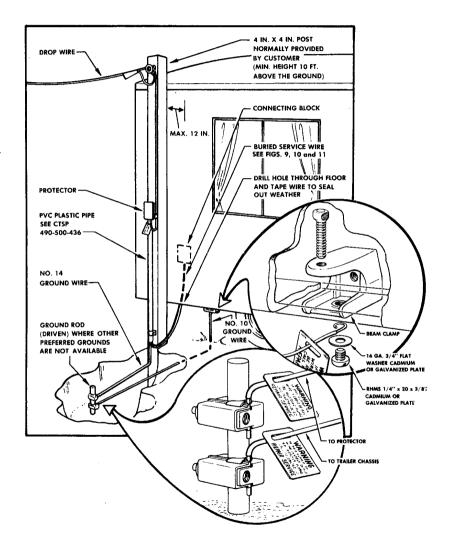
Typical Installation—Aerial Distribution, Ground Rod Ground
